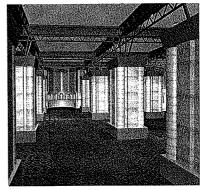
Covering project of the Big Hall and the Diwan Hall.
